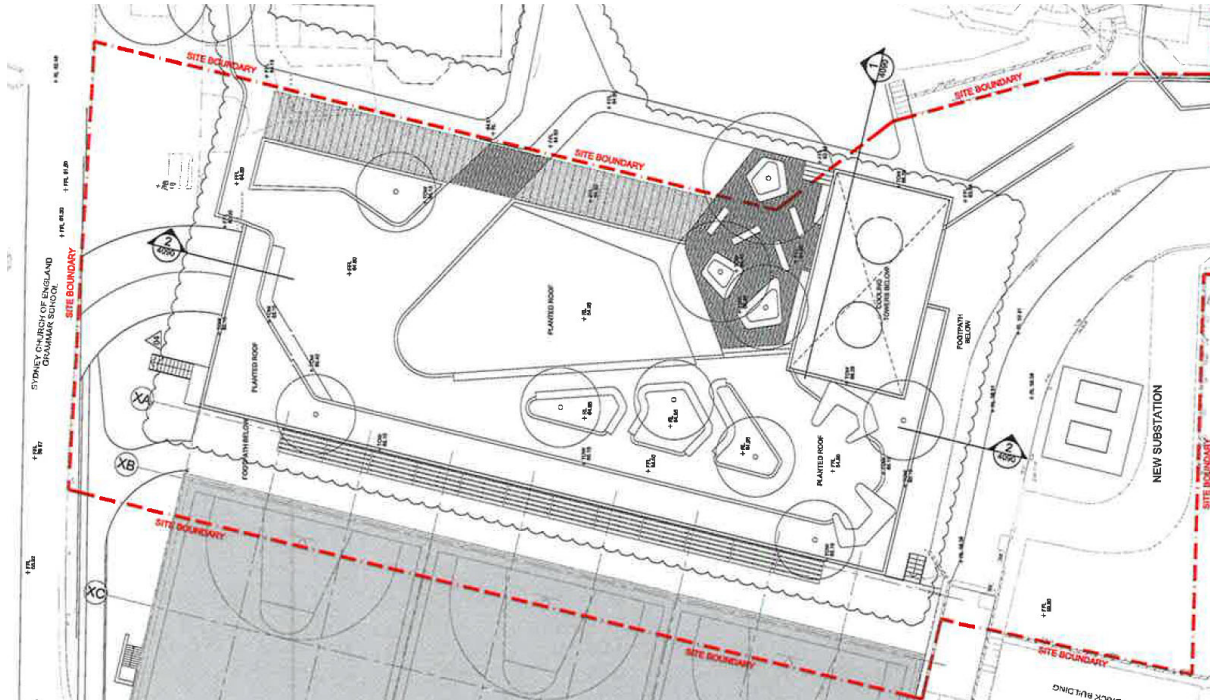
APPROVED Bishopsgate car park roof terrace (Source: Stamped Plan, COX, A-DA-2192, Revision 04)
